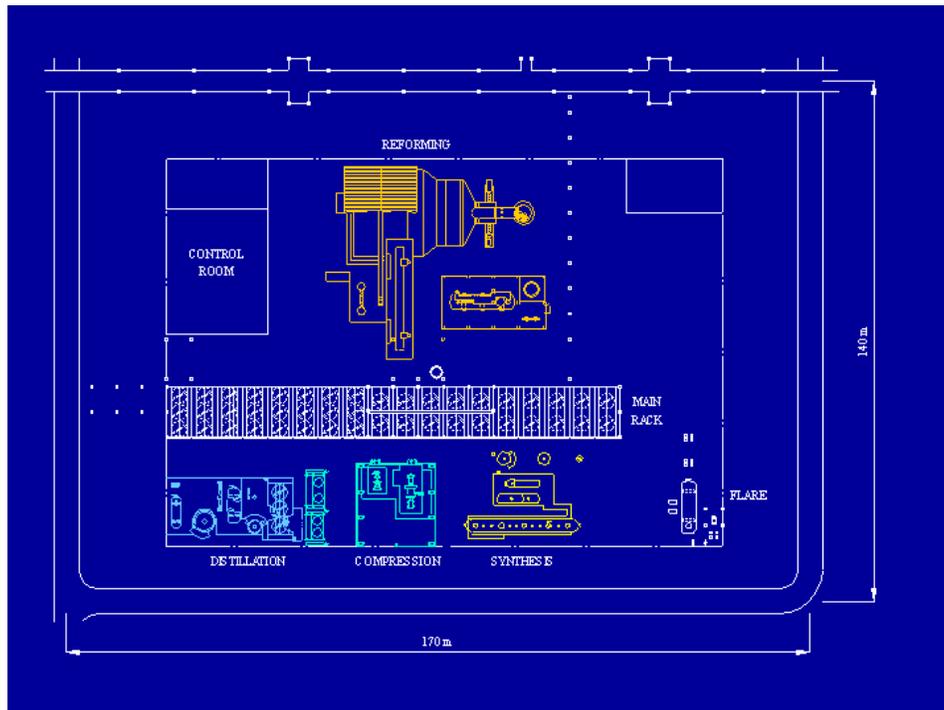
Simplified Plant Layout of New Methanol Plant
